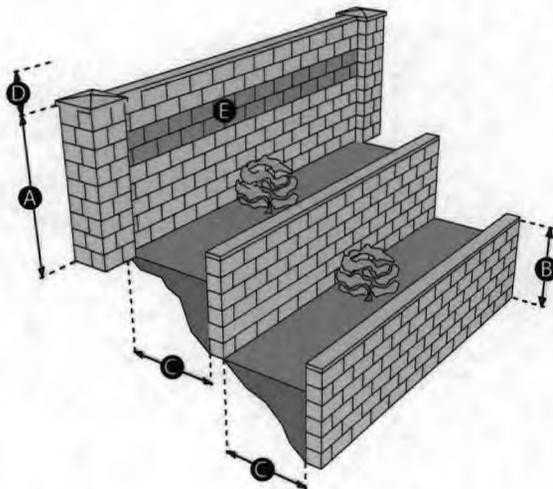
RETAINING AND PERIMETER WALL STANDARD STEPBACK
